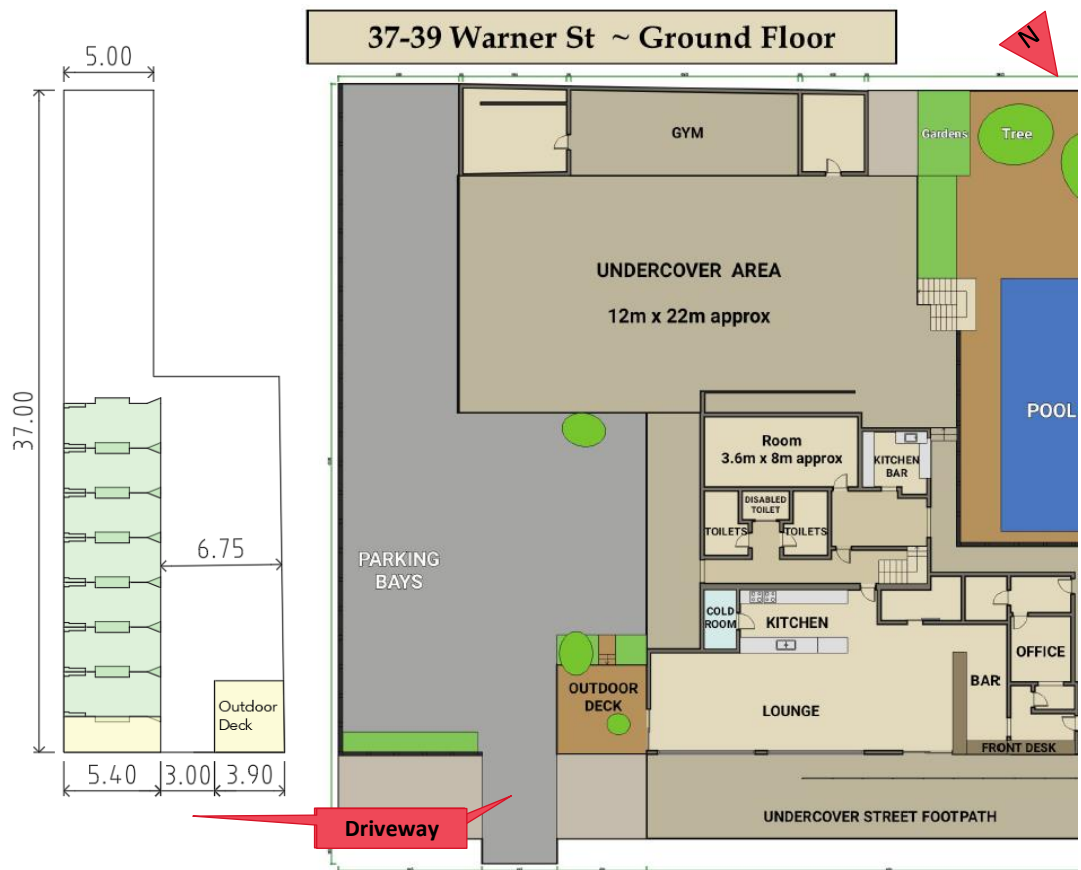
Port Douglas Backpackers – Parking area (l. dimensions based on google maps, r. Ground floor plan)
